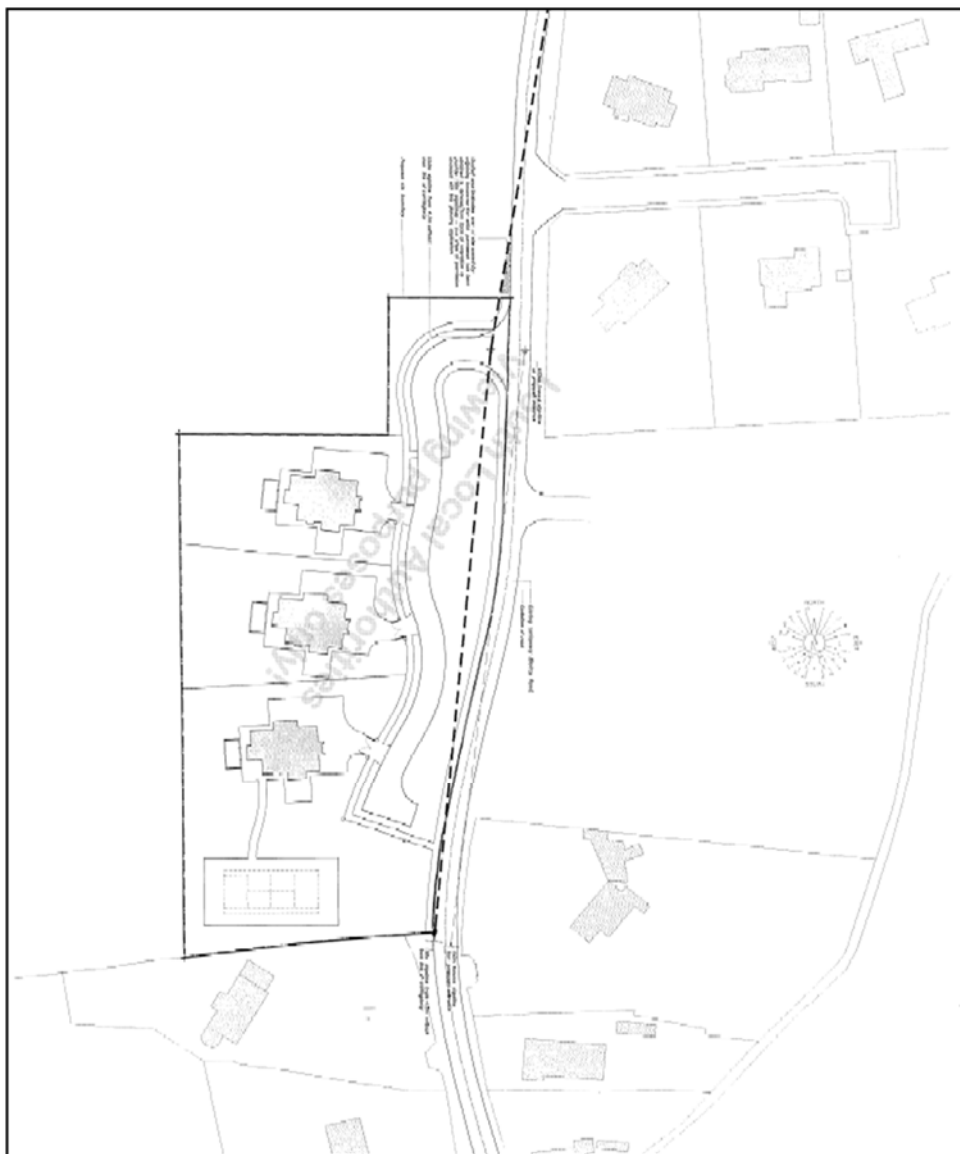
Approved Site Layout Plan as per Planning Ref: 071398
